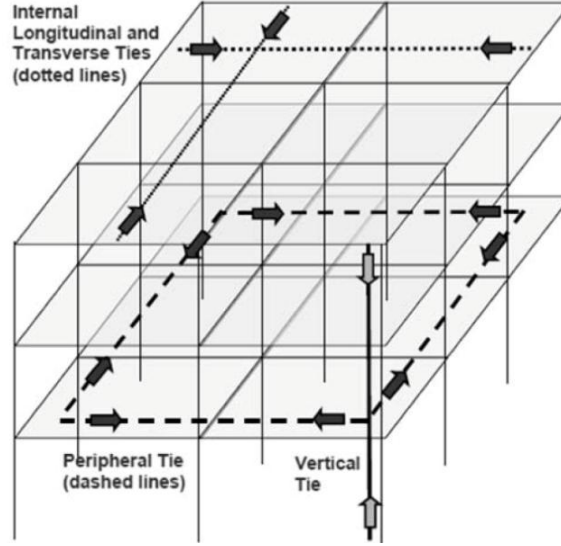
Schematic of tie forces in a frame structure (GSA)
